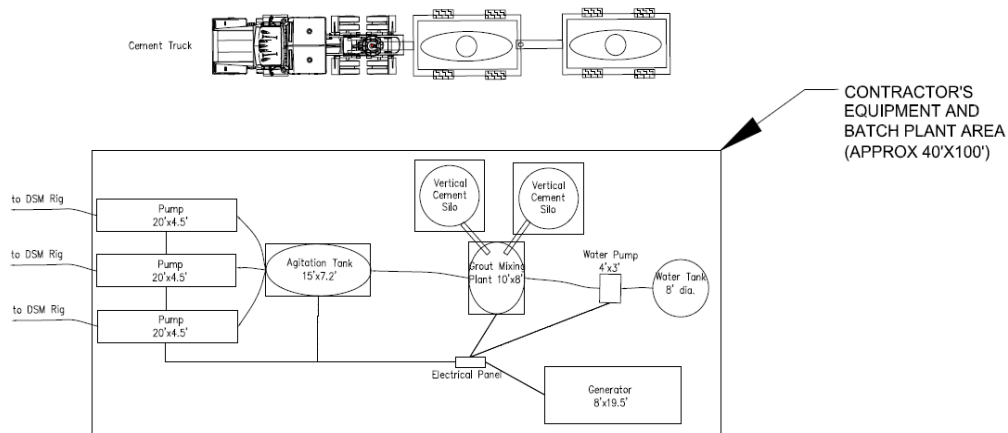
Example Batch Plant Setup (about 40 x 100 ft area)
